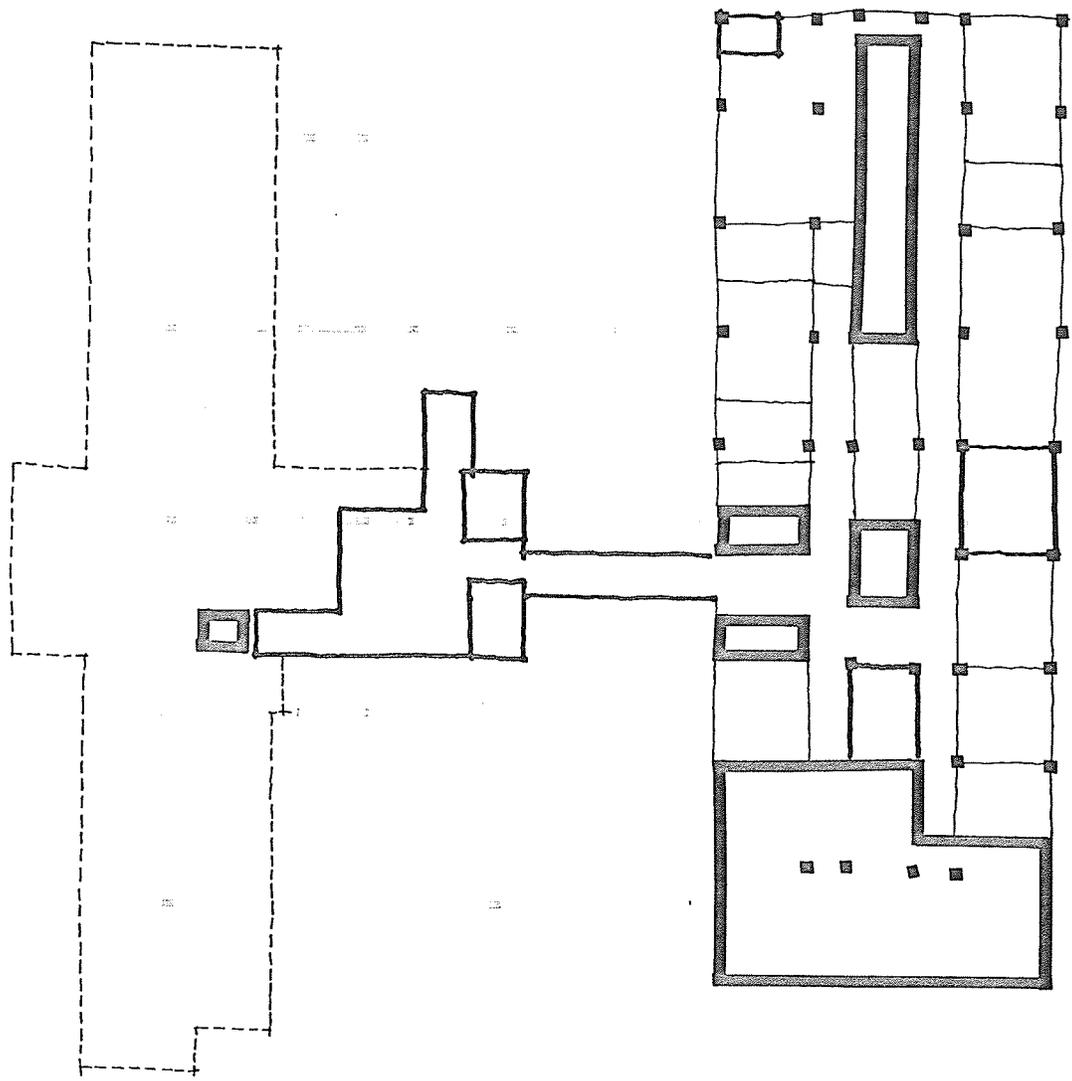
EXISTING HOSPITAL, SECOND FLOOR
